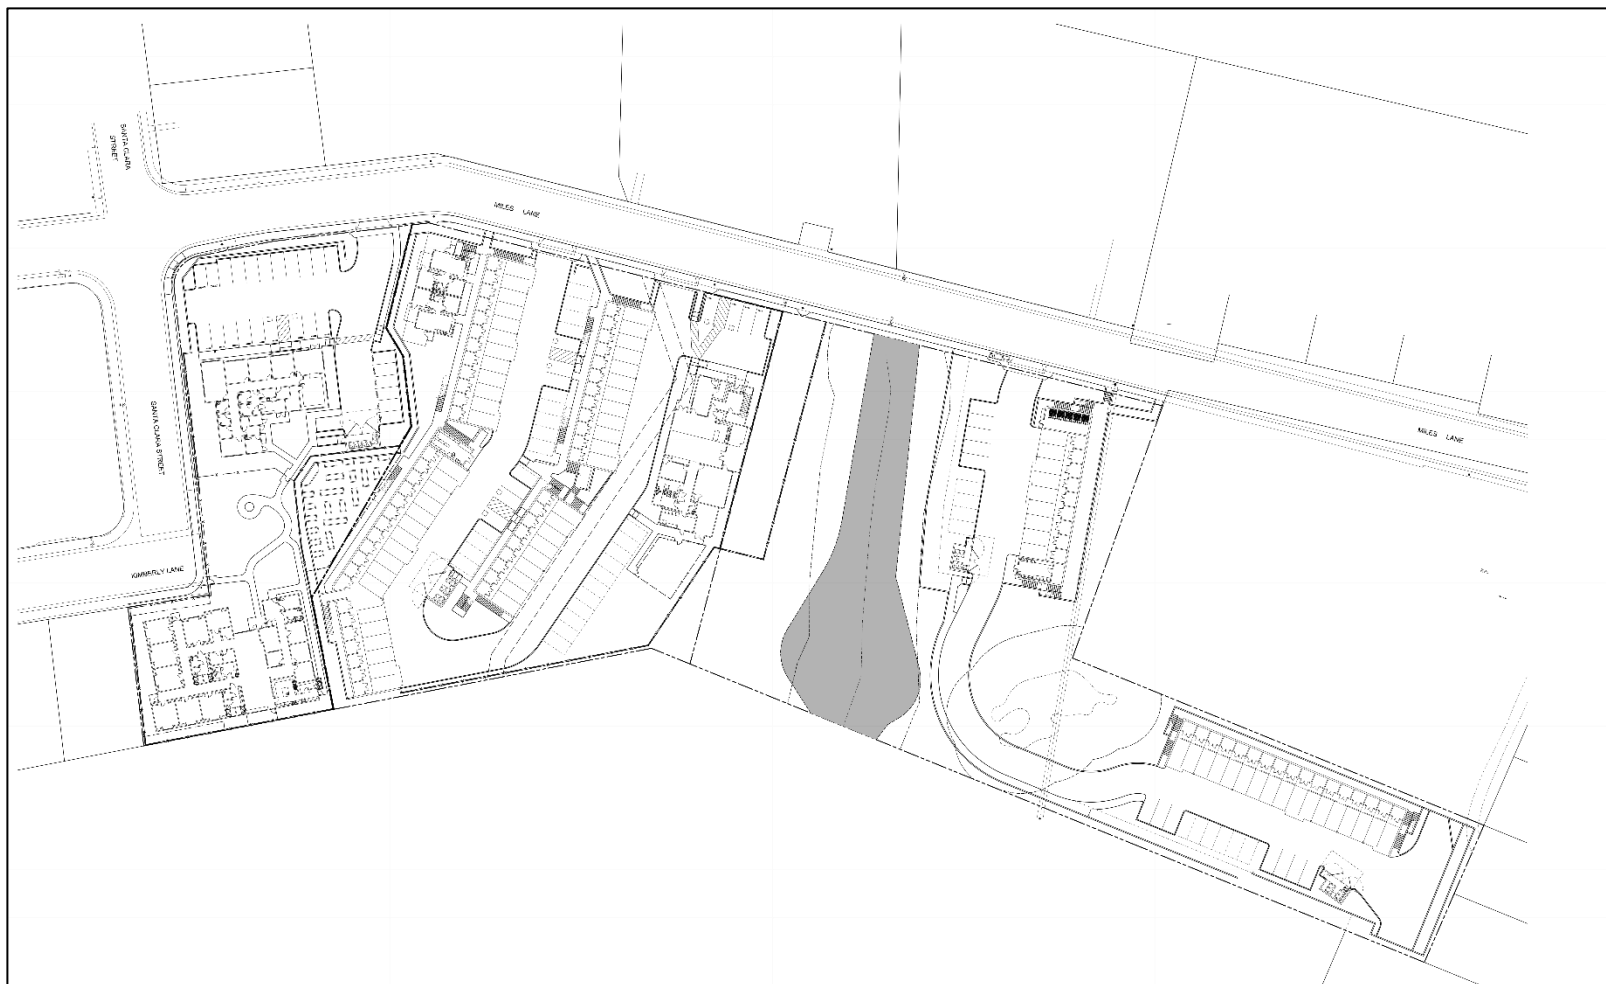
Proposed Site Plan, June 4, 2019 (Developed by: Wald Runkle & Dost Architects LLC)
